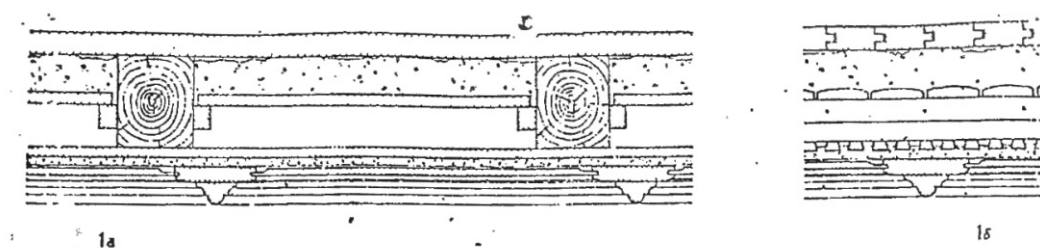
Wooden floor construction with a decorative ceiling – sections (Popov, 1963)
